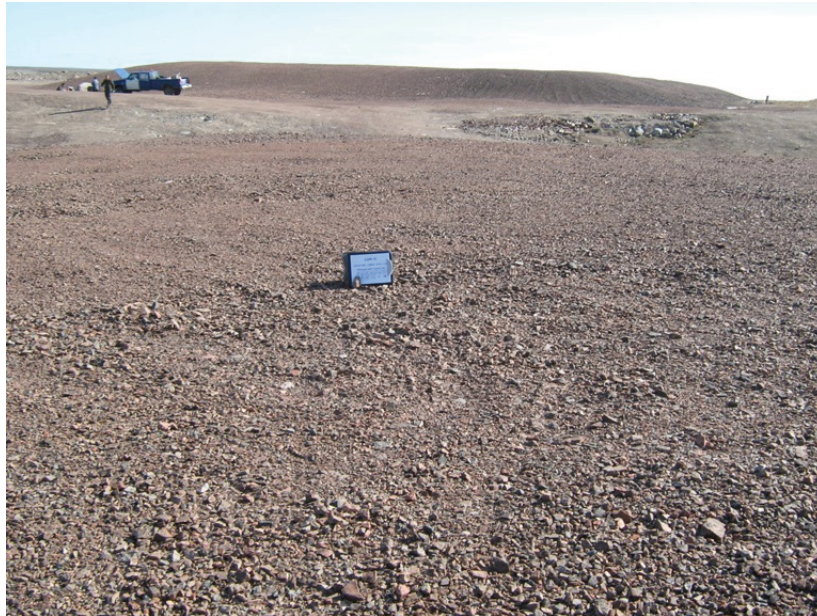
Panoramic photo facing southeast to the north slope at northwest end. Minor erosion of fines but self armouring. ↑
